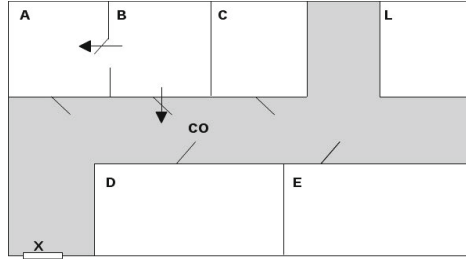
An example of floor plan that consists of rooms (A , B , C , D , and E), an elevator (L), an exit (X) and a corridor (CO). Room B is a power control room that supplies electricity to the whole floor. This room is locked. It requires a key to access.
